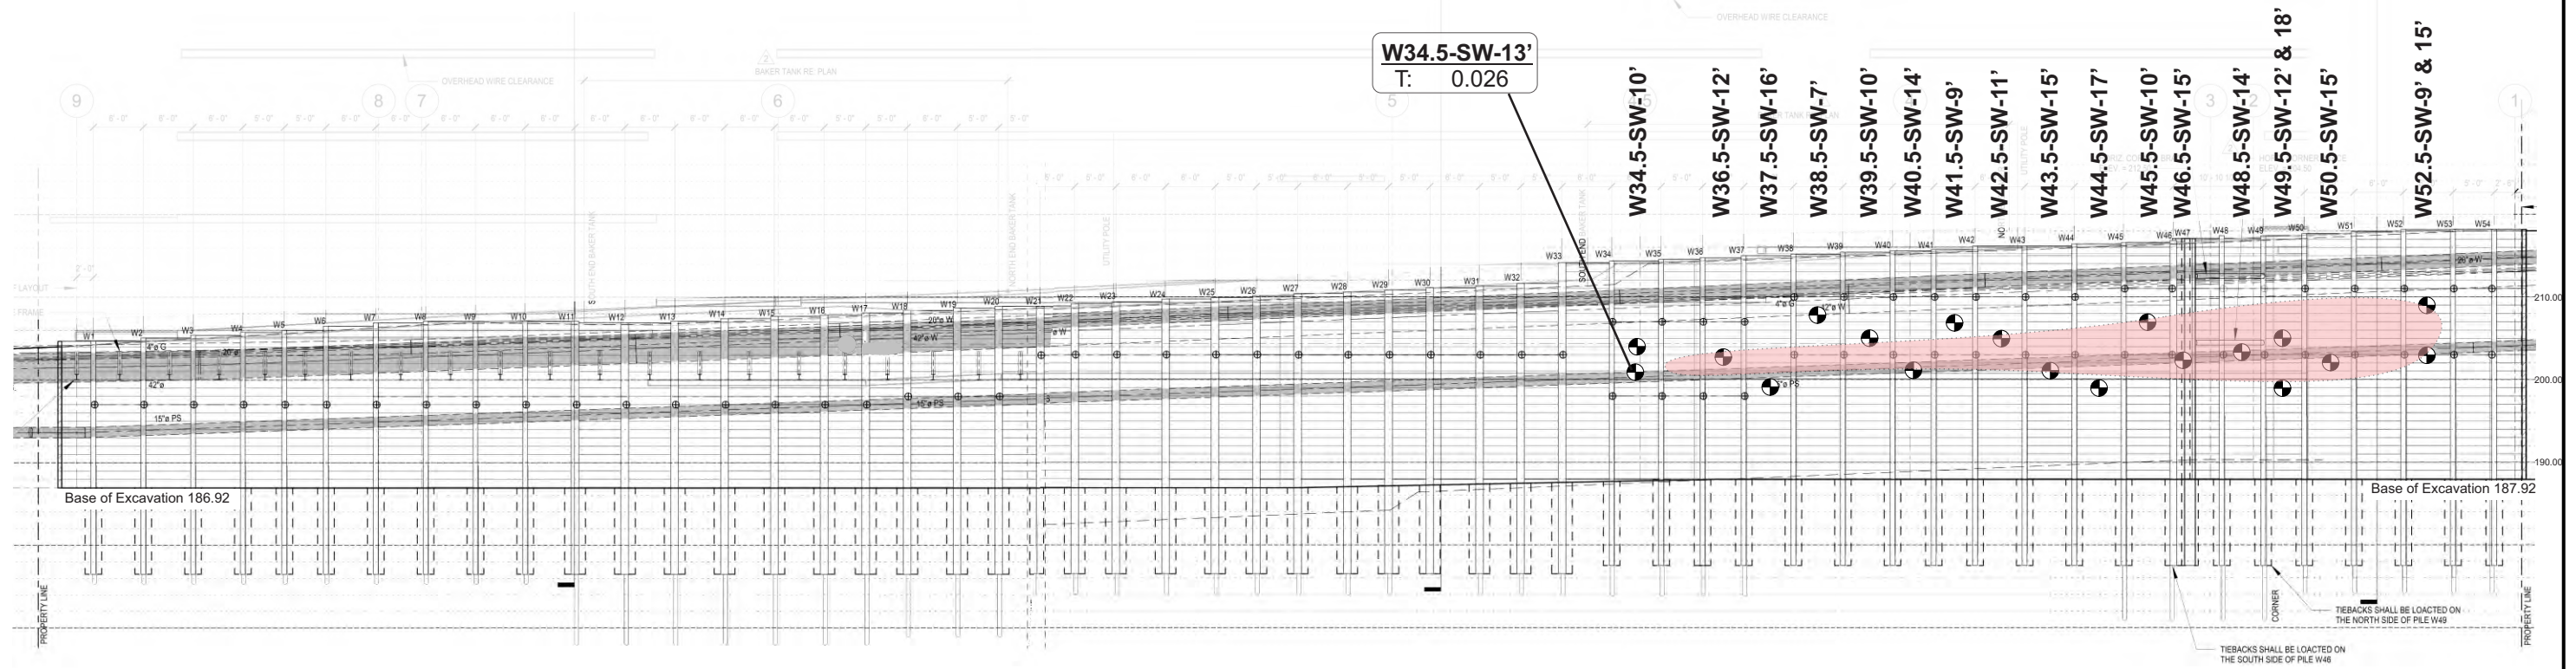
Excavation East Sidewall Confirmation Sample Locations
